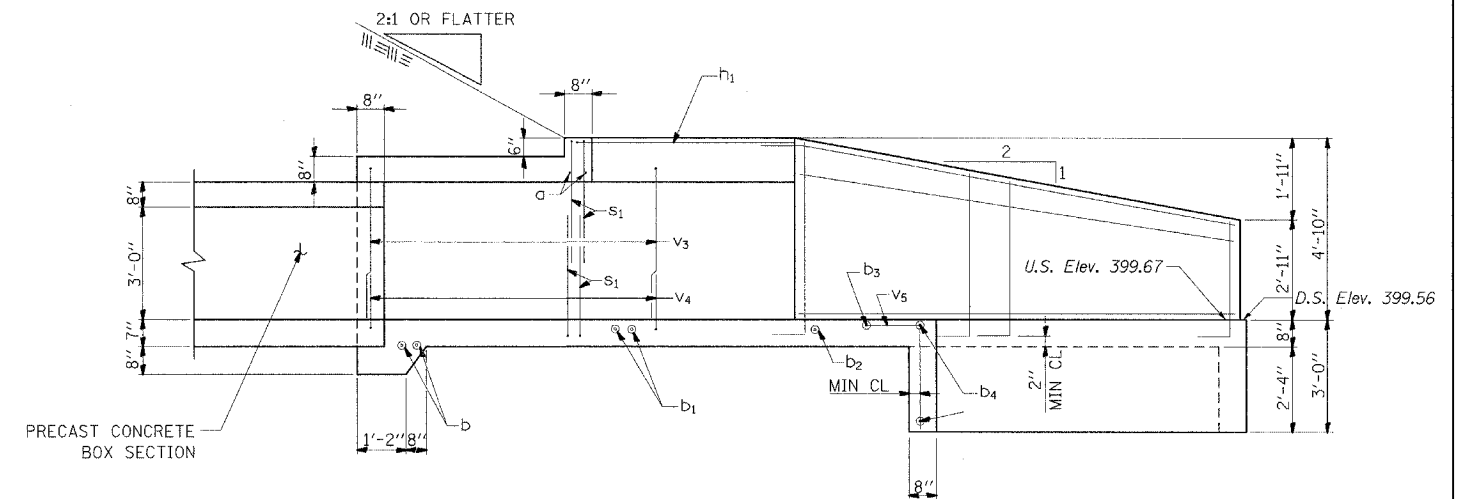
DETAIL: CAST-IN-PLACE APRON END SECTION STATION 166+22
